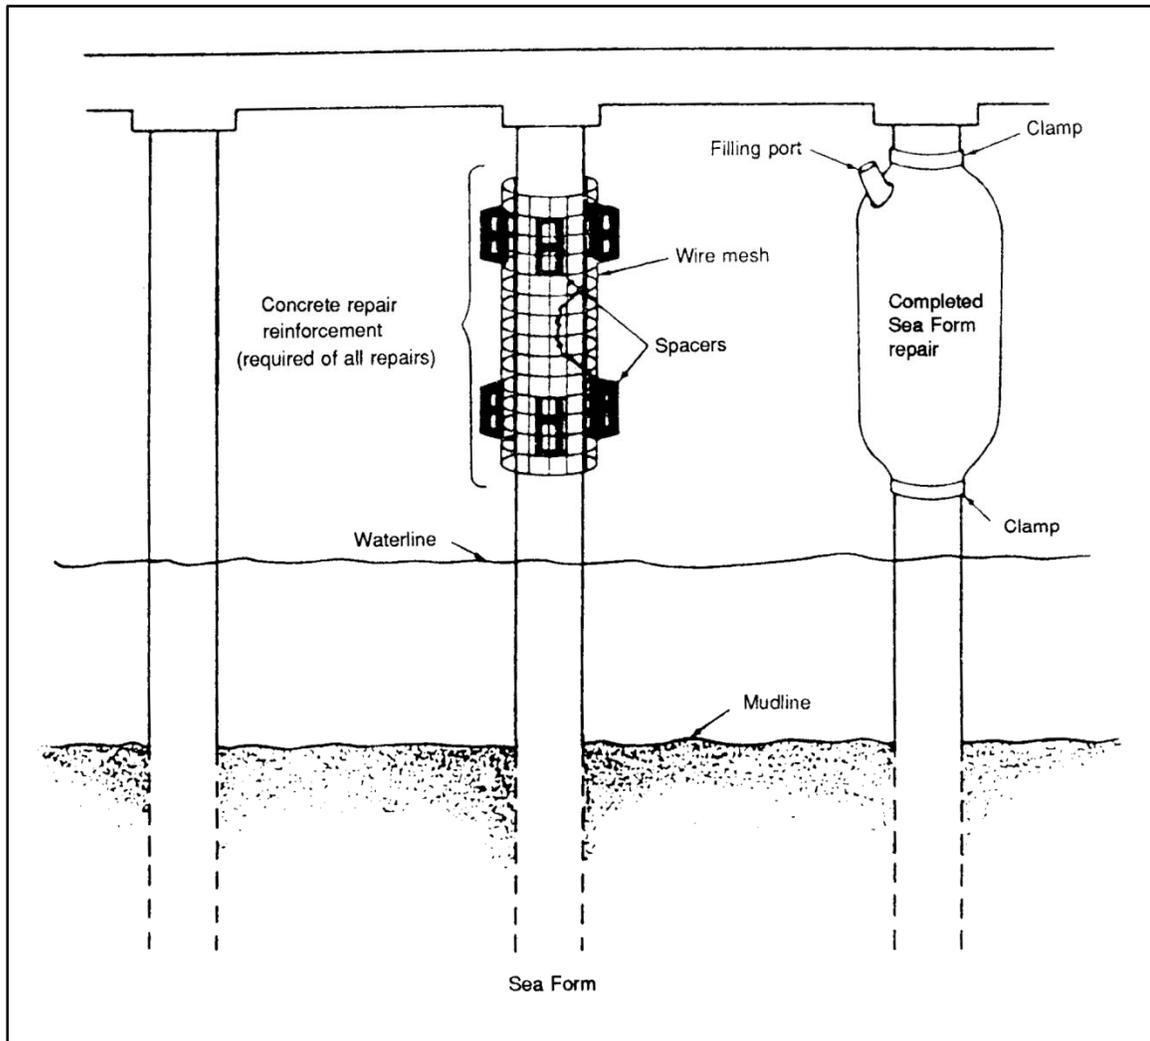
Reinforced concrete pile repairs using “sea forms”
